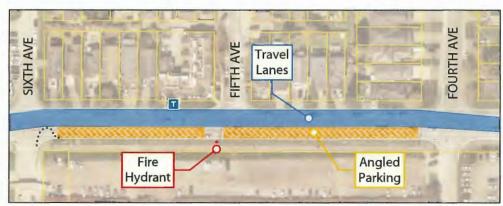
Angled Parking on Chatham Street between Fourth Avenue and Sixth Avenue
